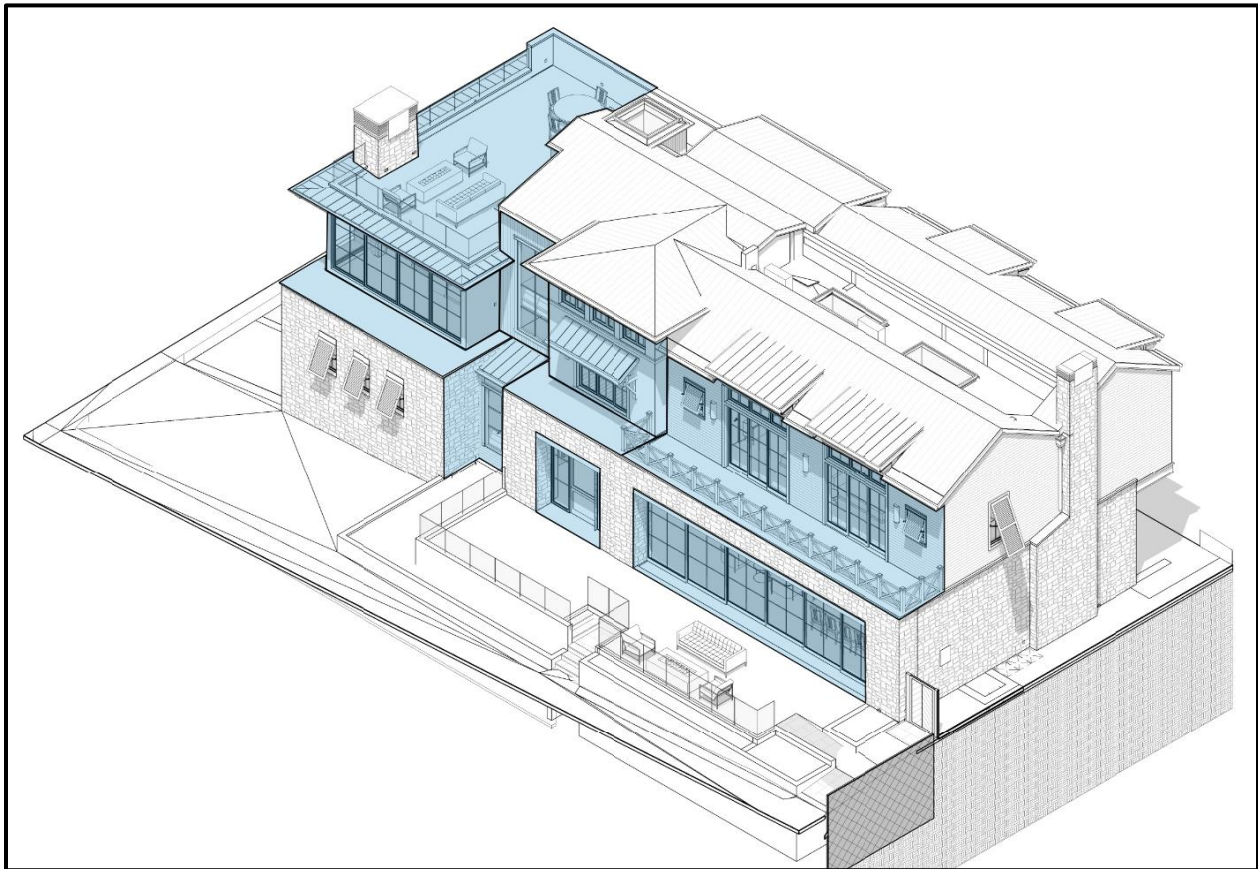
Façade Modulation and Articulation along Heliotrope Avenue
